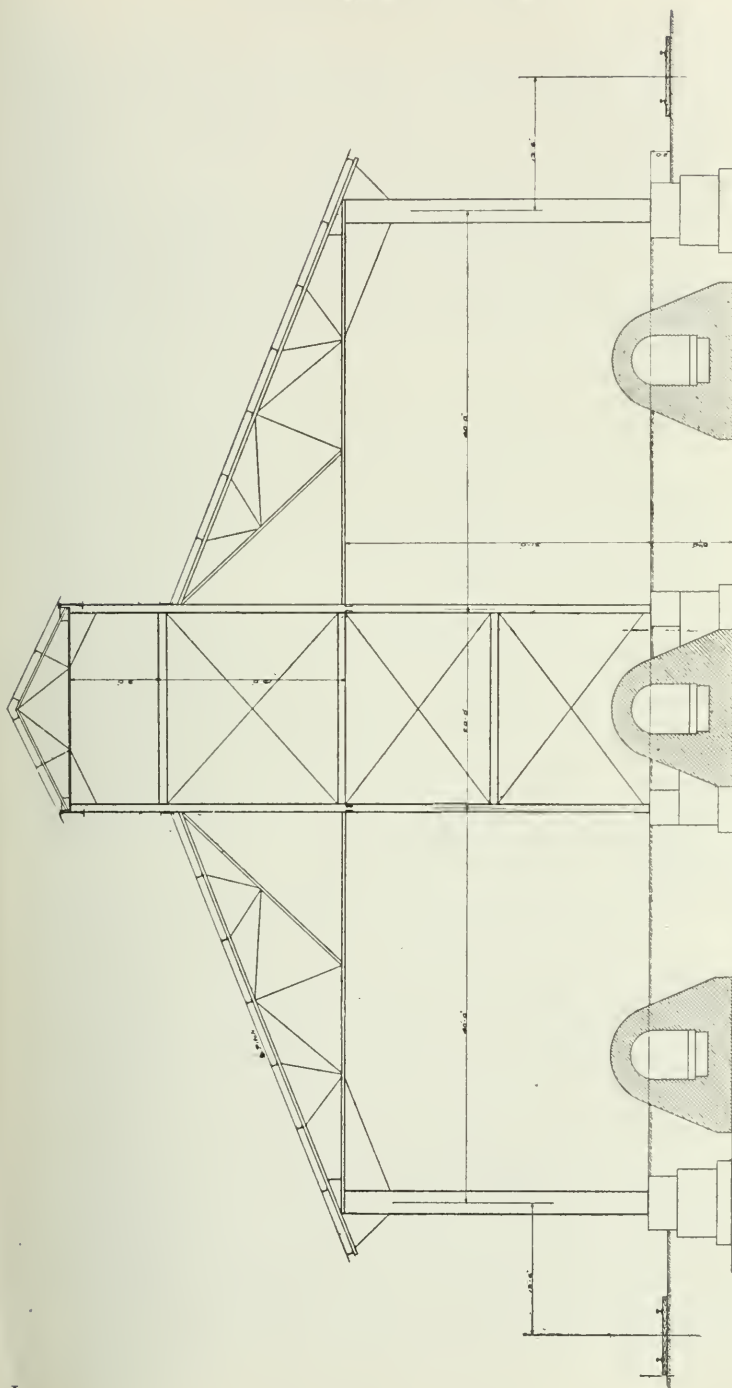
Plant No. 3. Steel Frame Construction, with Monitor Floor, Supported on Steel Columns. Buffington, Ind.
